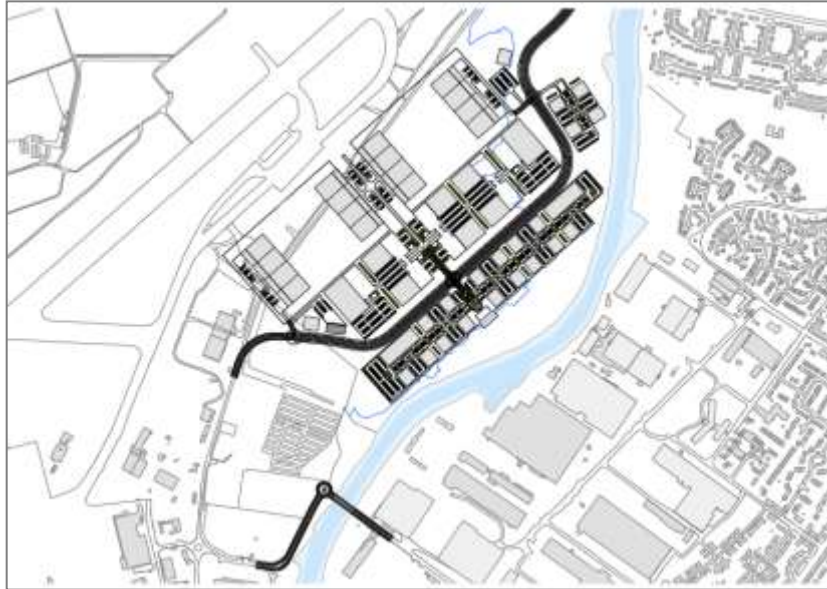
GAIA North Masterplan showing Wright Street Bridge
